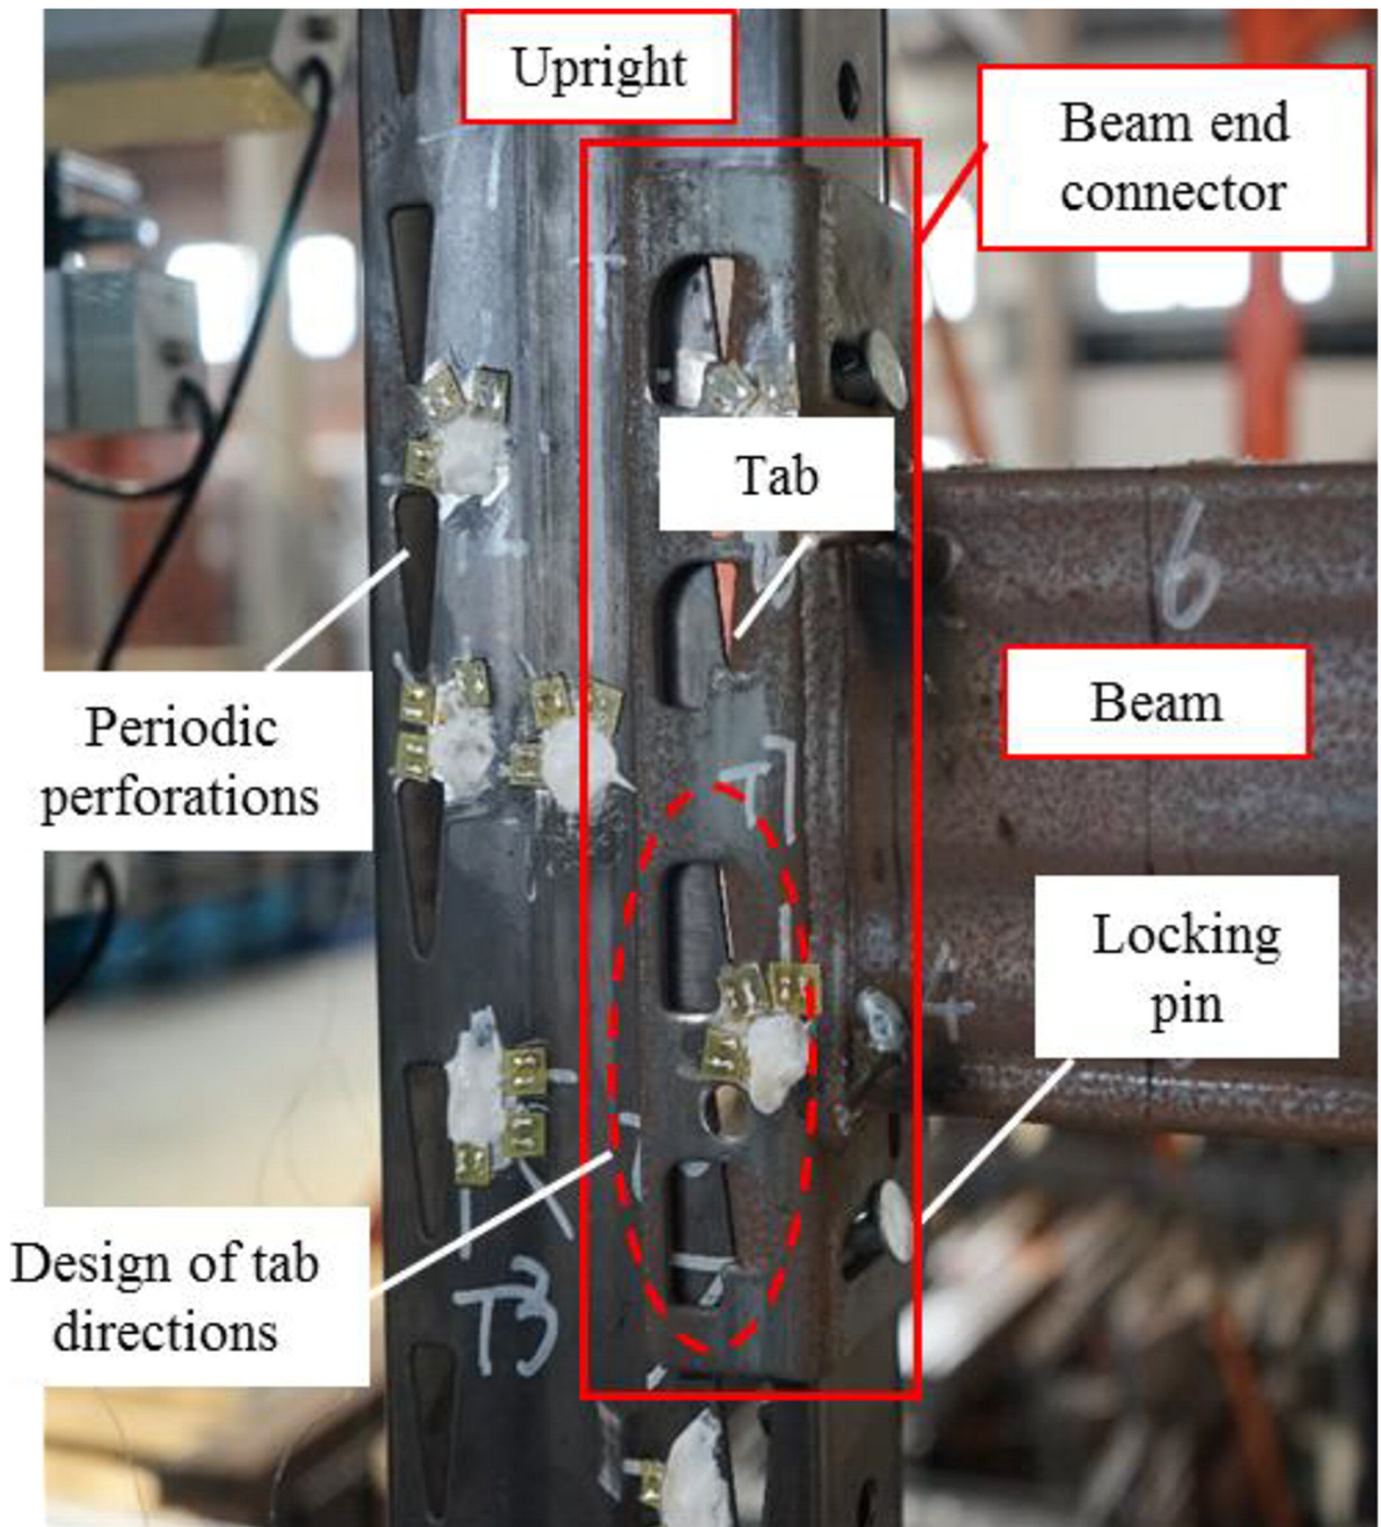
Steel storage rack beam-to-upright boltless connection.
